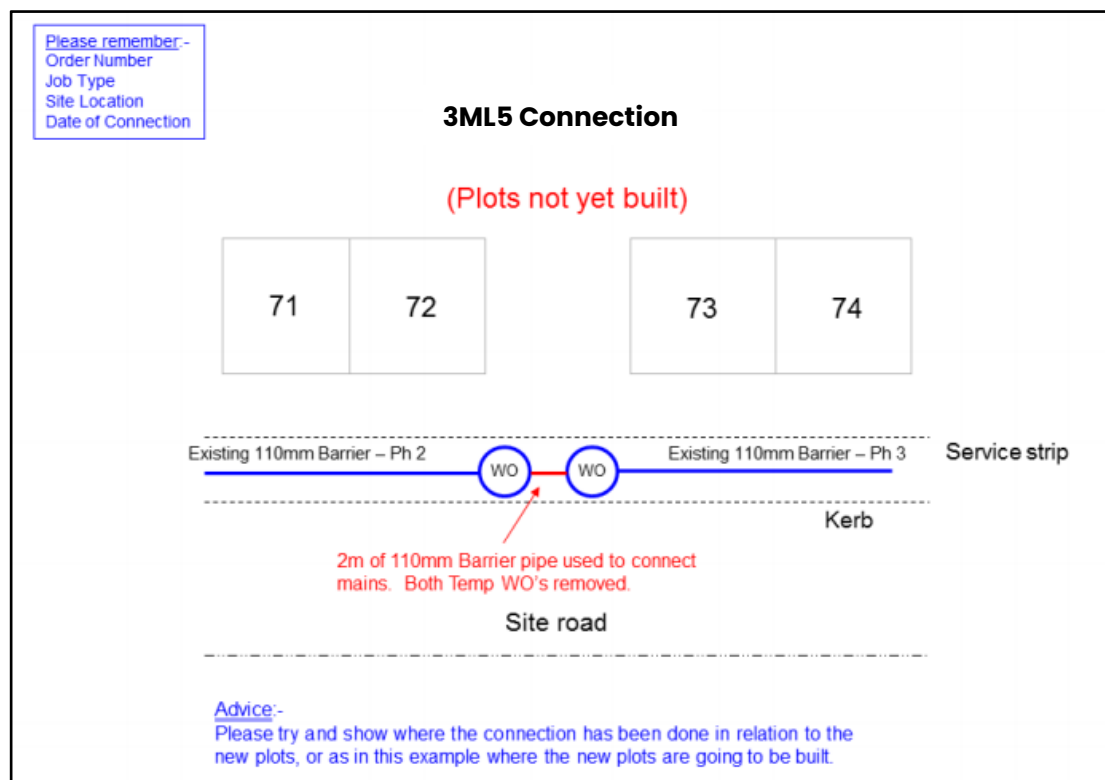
Example 'As Built' Drawing – 3ML5 Connection
